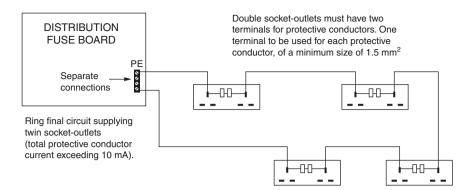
Recommended method of connecting IT equipment to socket outlets.
